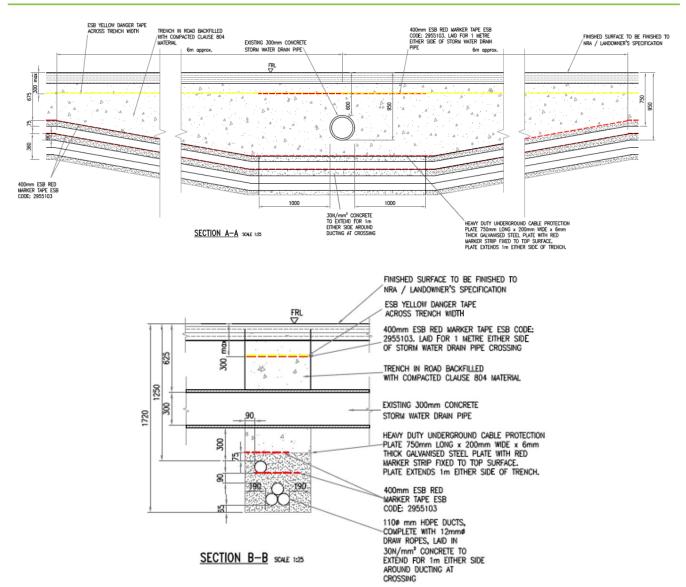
Piped Culvert Crossings – Ducting under Culvert Crossing Details
